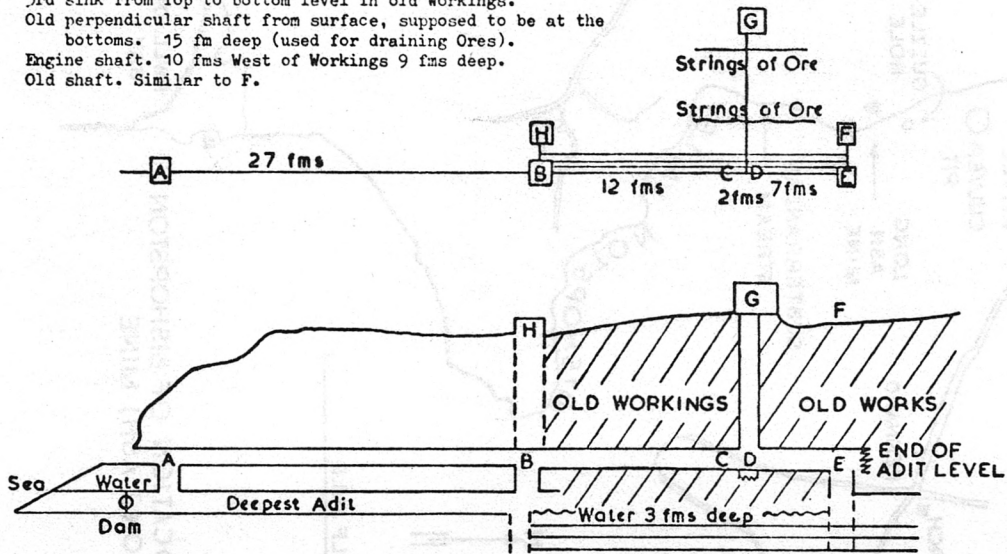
HENRY FRANCIS'S PLAN & SECTION OF BISHOPSTONE MINE 1849 (redrawn)
